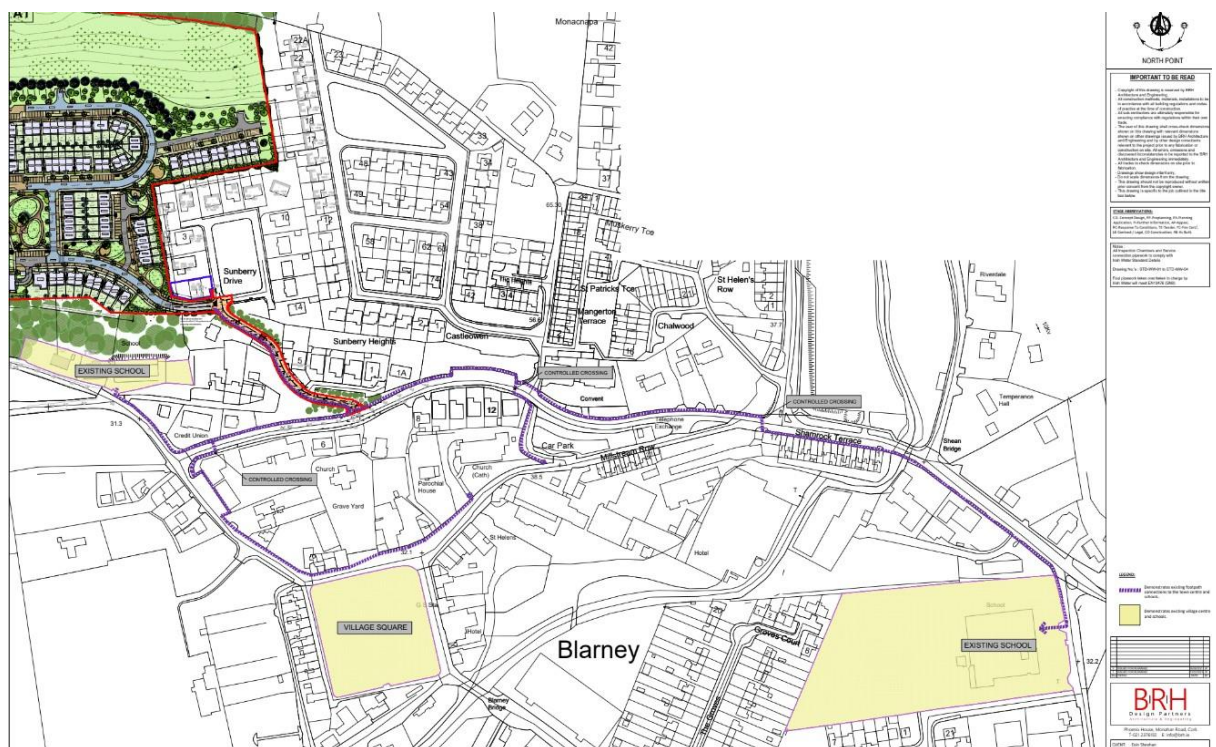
Proposed development site relative to the existing pedestrian connections to Blarney Town Centre
